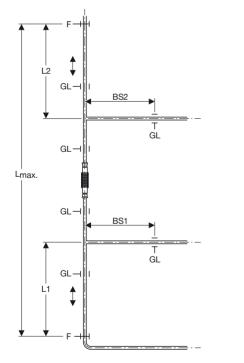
Expansion compensation by axial expansion fitting with anchor point in bottom floor.
